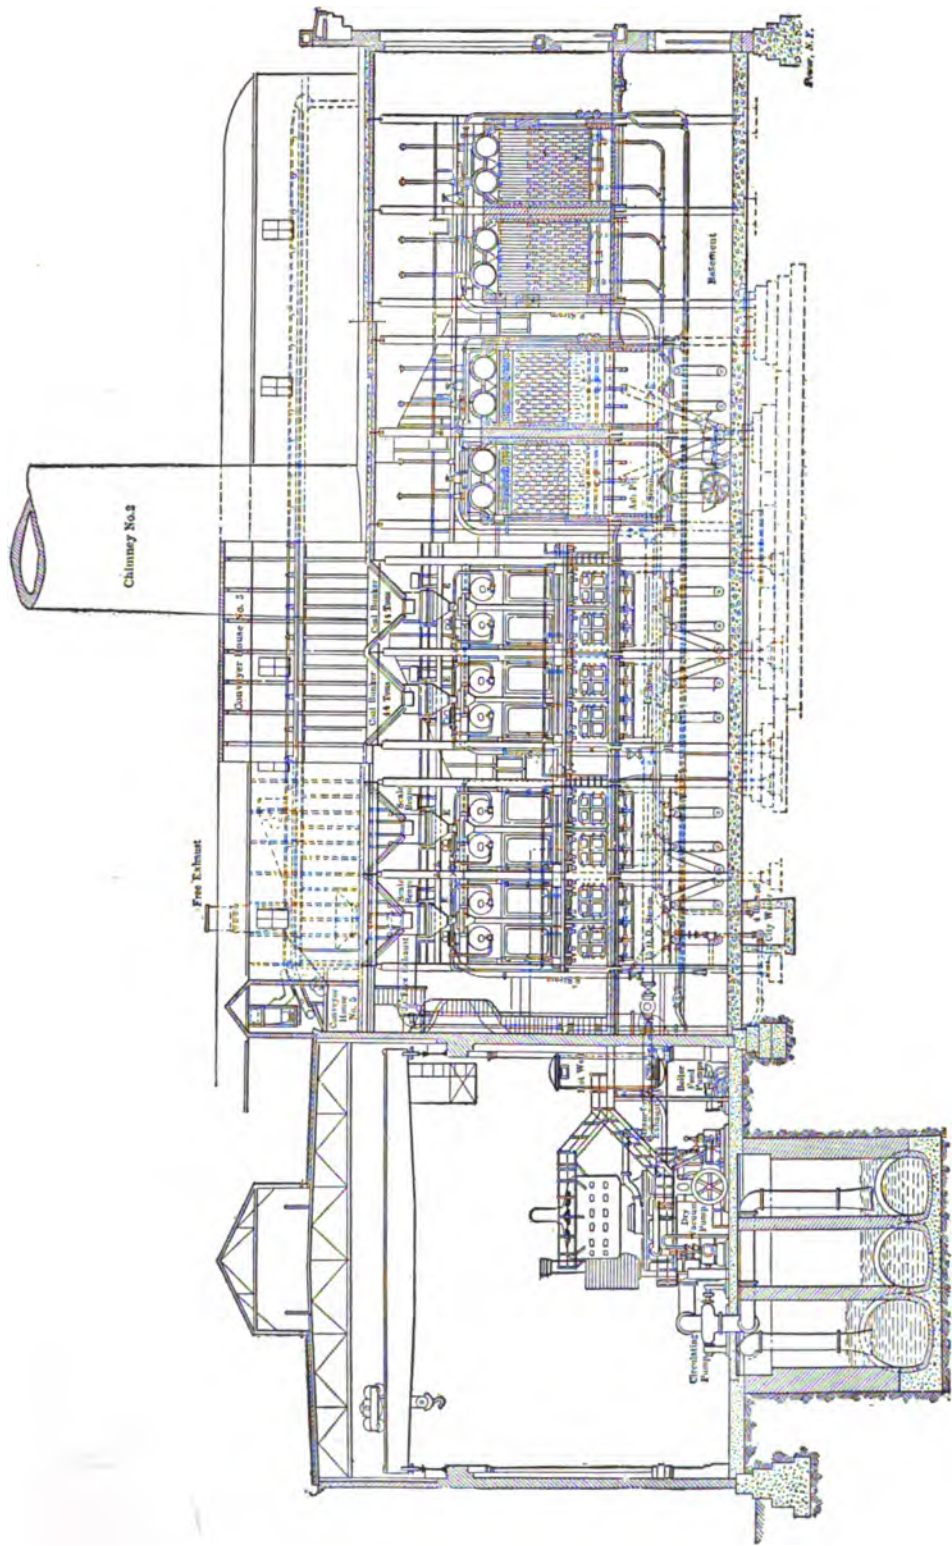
Longitudinal Section of L Street Plant, Boston.
